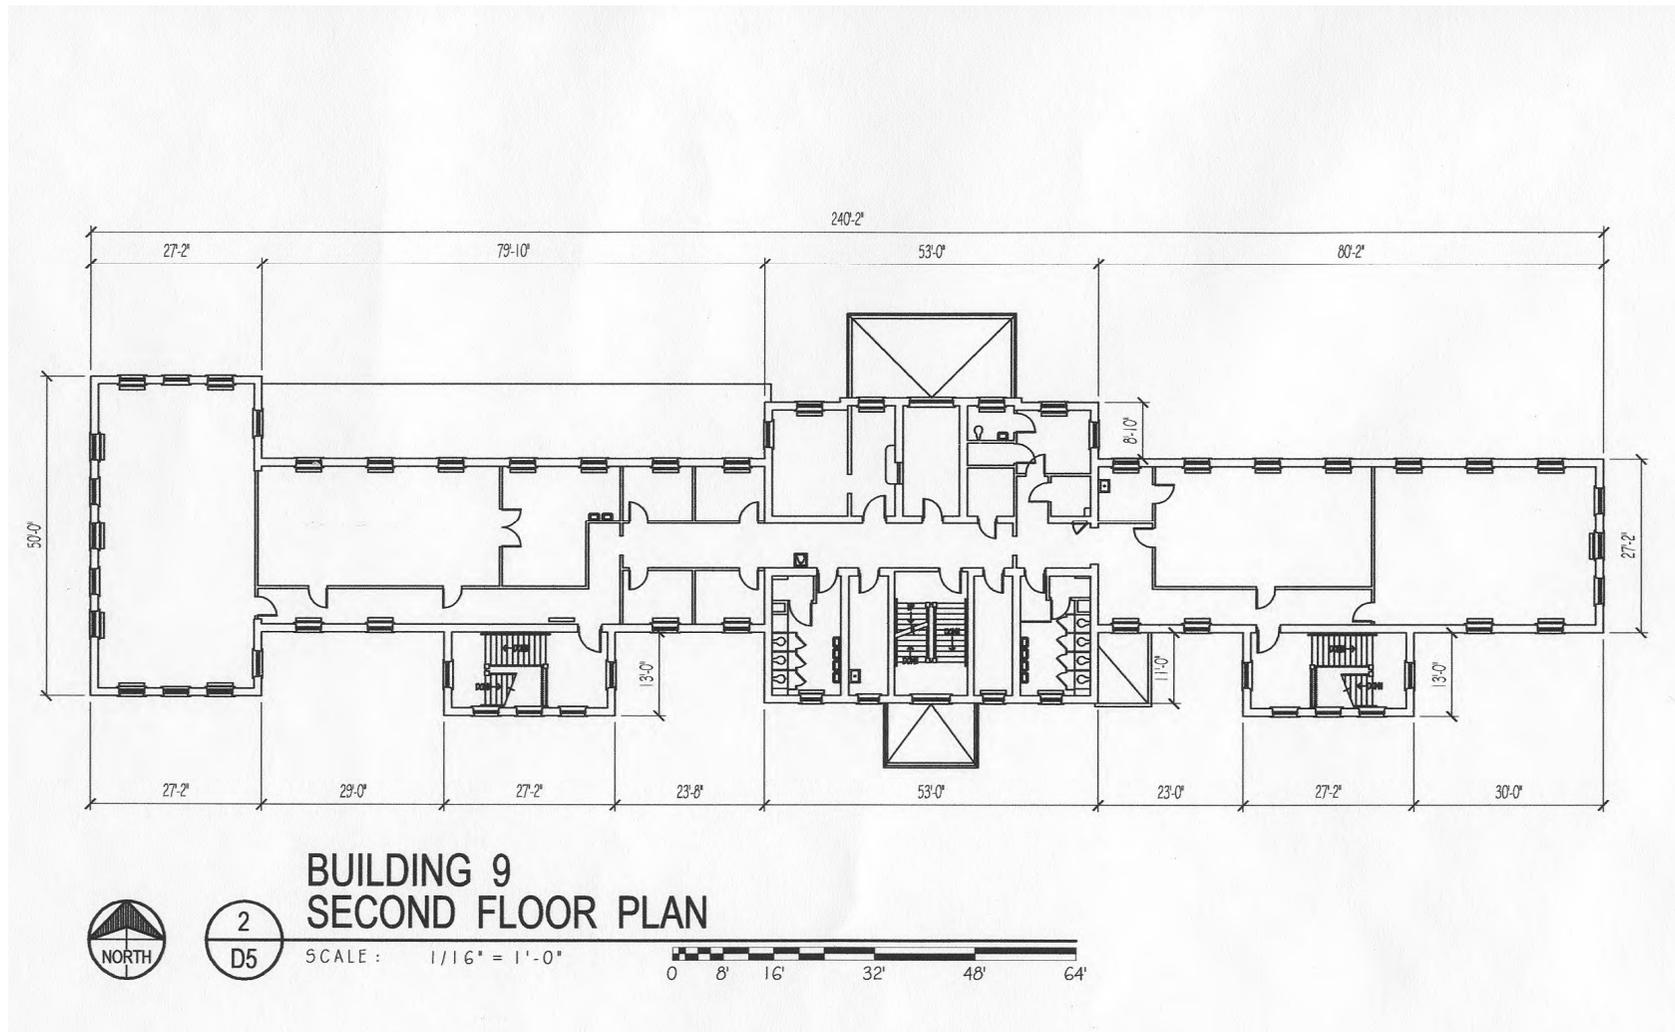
Second floor plan of Building 9, showing existing conditions (Walton and Associates 2003).
